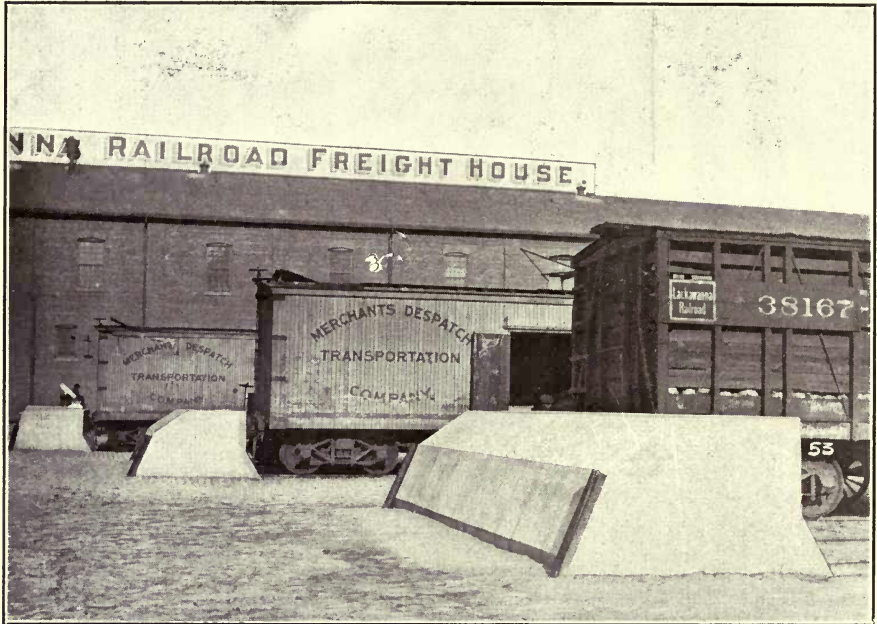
CONCRETE BUMPING POSTS, D., L. & W. R. R.
